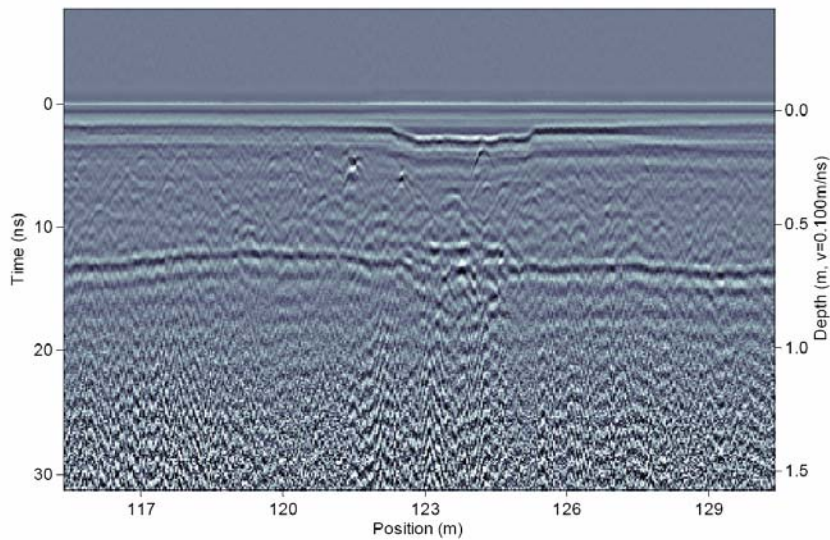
GPR longitudinal section over open-cut installed pipe near position 124 m
